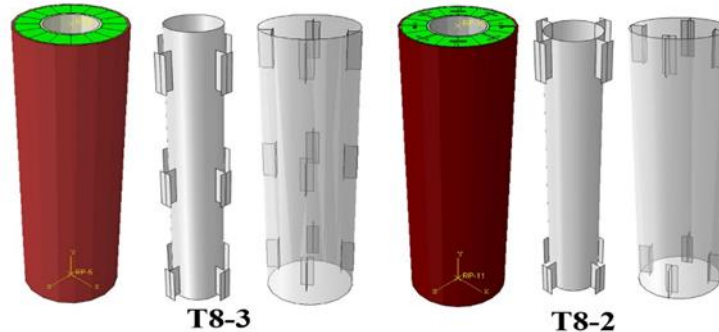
Examples of double shell steel columns filled with concrete with T-shaped stiffeners at 3 and 2 parts of the column height (examples "T8-3" and "T8-2").
